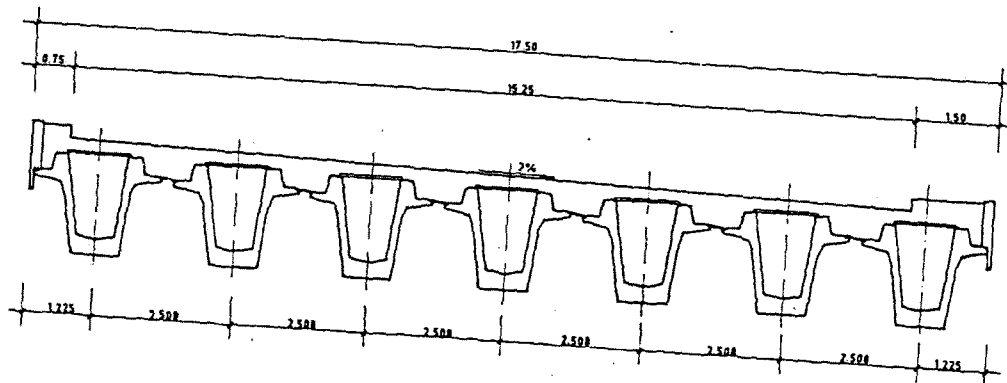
Typical Cross Section of the Deck (dimensions in meter)
